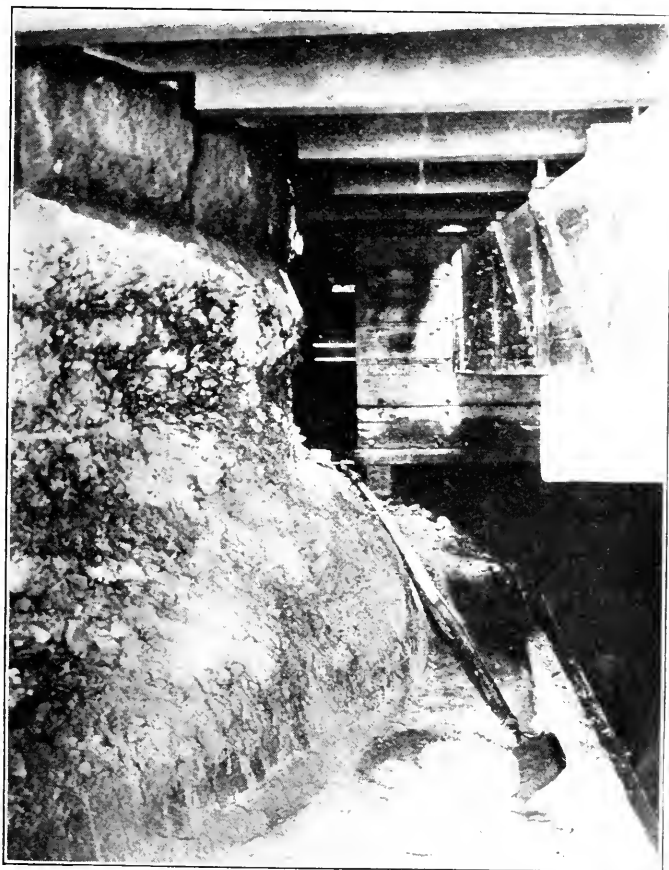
Concrete Piers, Dover Street Bridge, Boston.
